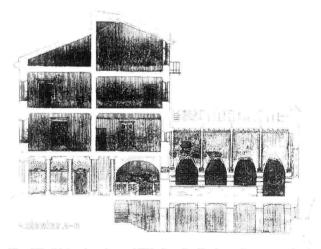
Main drawings, 1903, longitudinal section towards the west. (Union Bank of Finland Archives, photo SRM).
